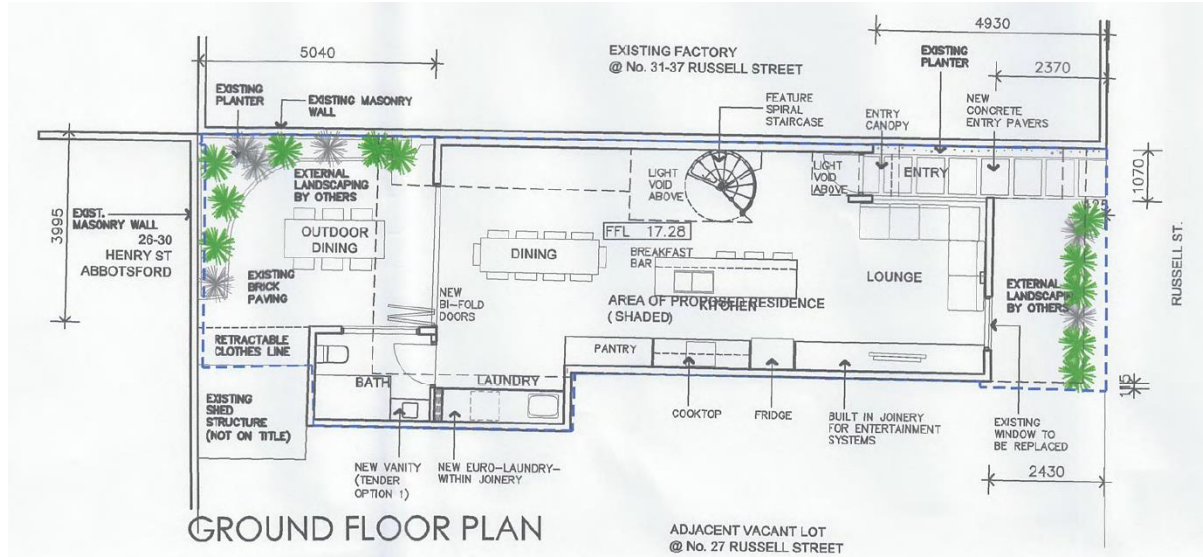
Ground floor plan of No. 29 Russell Street (as per plans endorsed as part of Planning Permit PLN13/0127).
